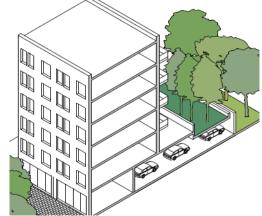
Design art for dwellings at Ebbsfleet which shows car parking underneath.
